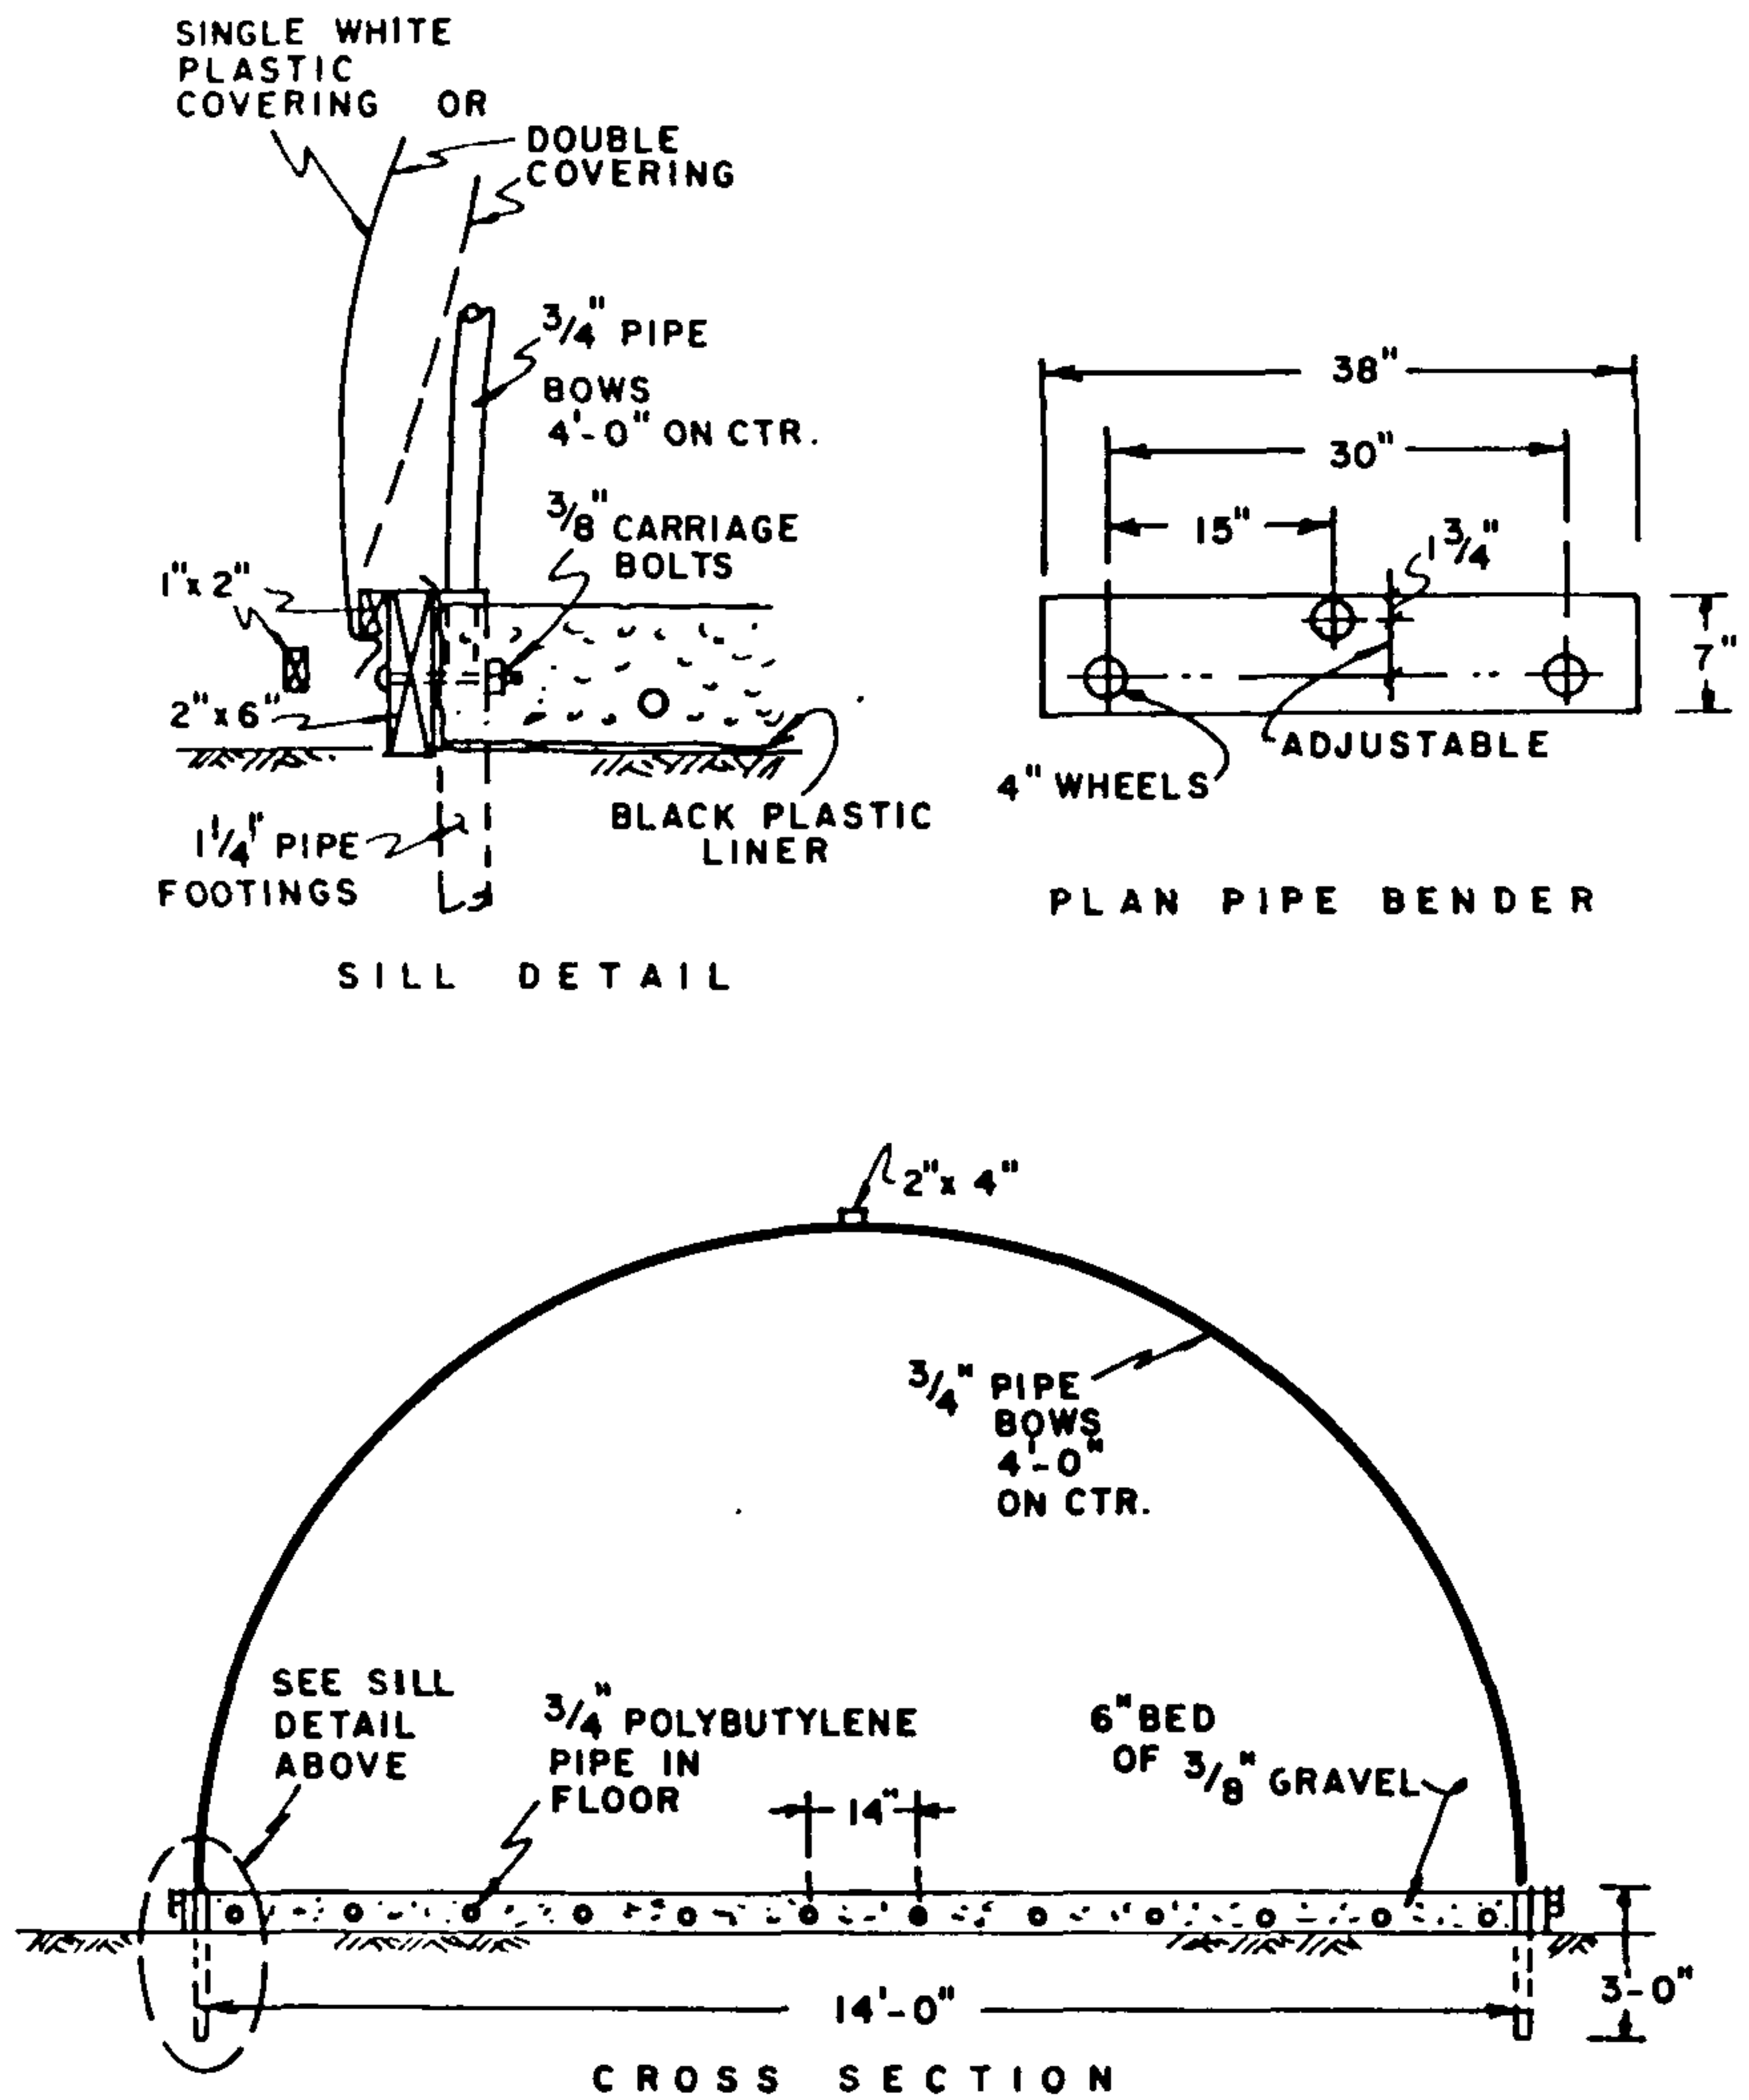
New Jersey Plan 153: Construction details of a floor heated nursery storage house.
